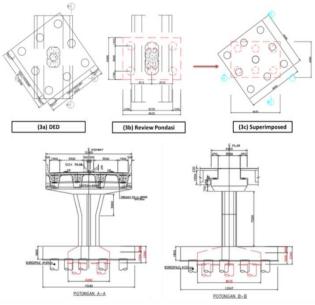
Adjustment of Foundation Piles on Pillar 2 and Pillar 3
